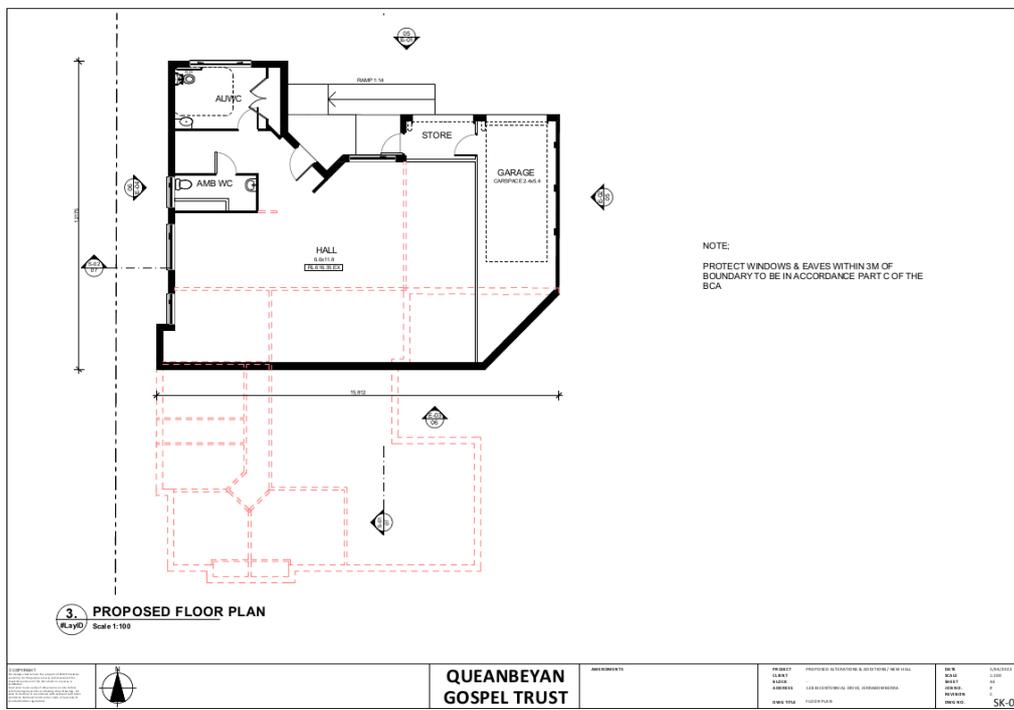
Proposed Floor Plan Under Rev.2022.1002 (prepared by Spaceful)
